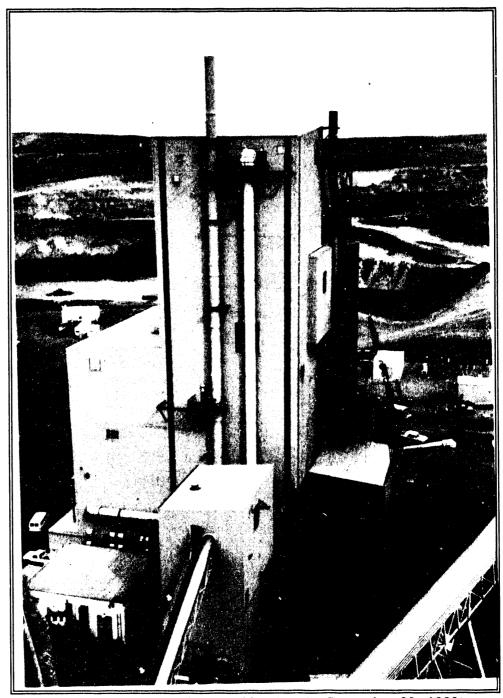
ENCOAL Plant Looking North (September 30, 1993).
